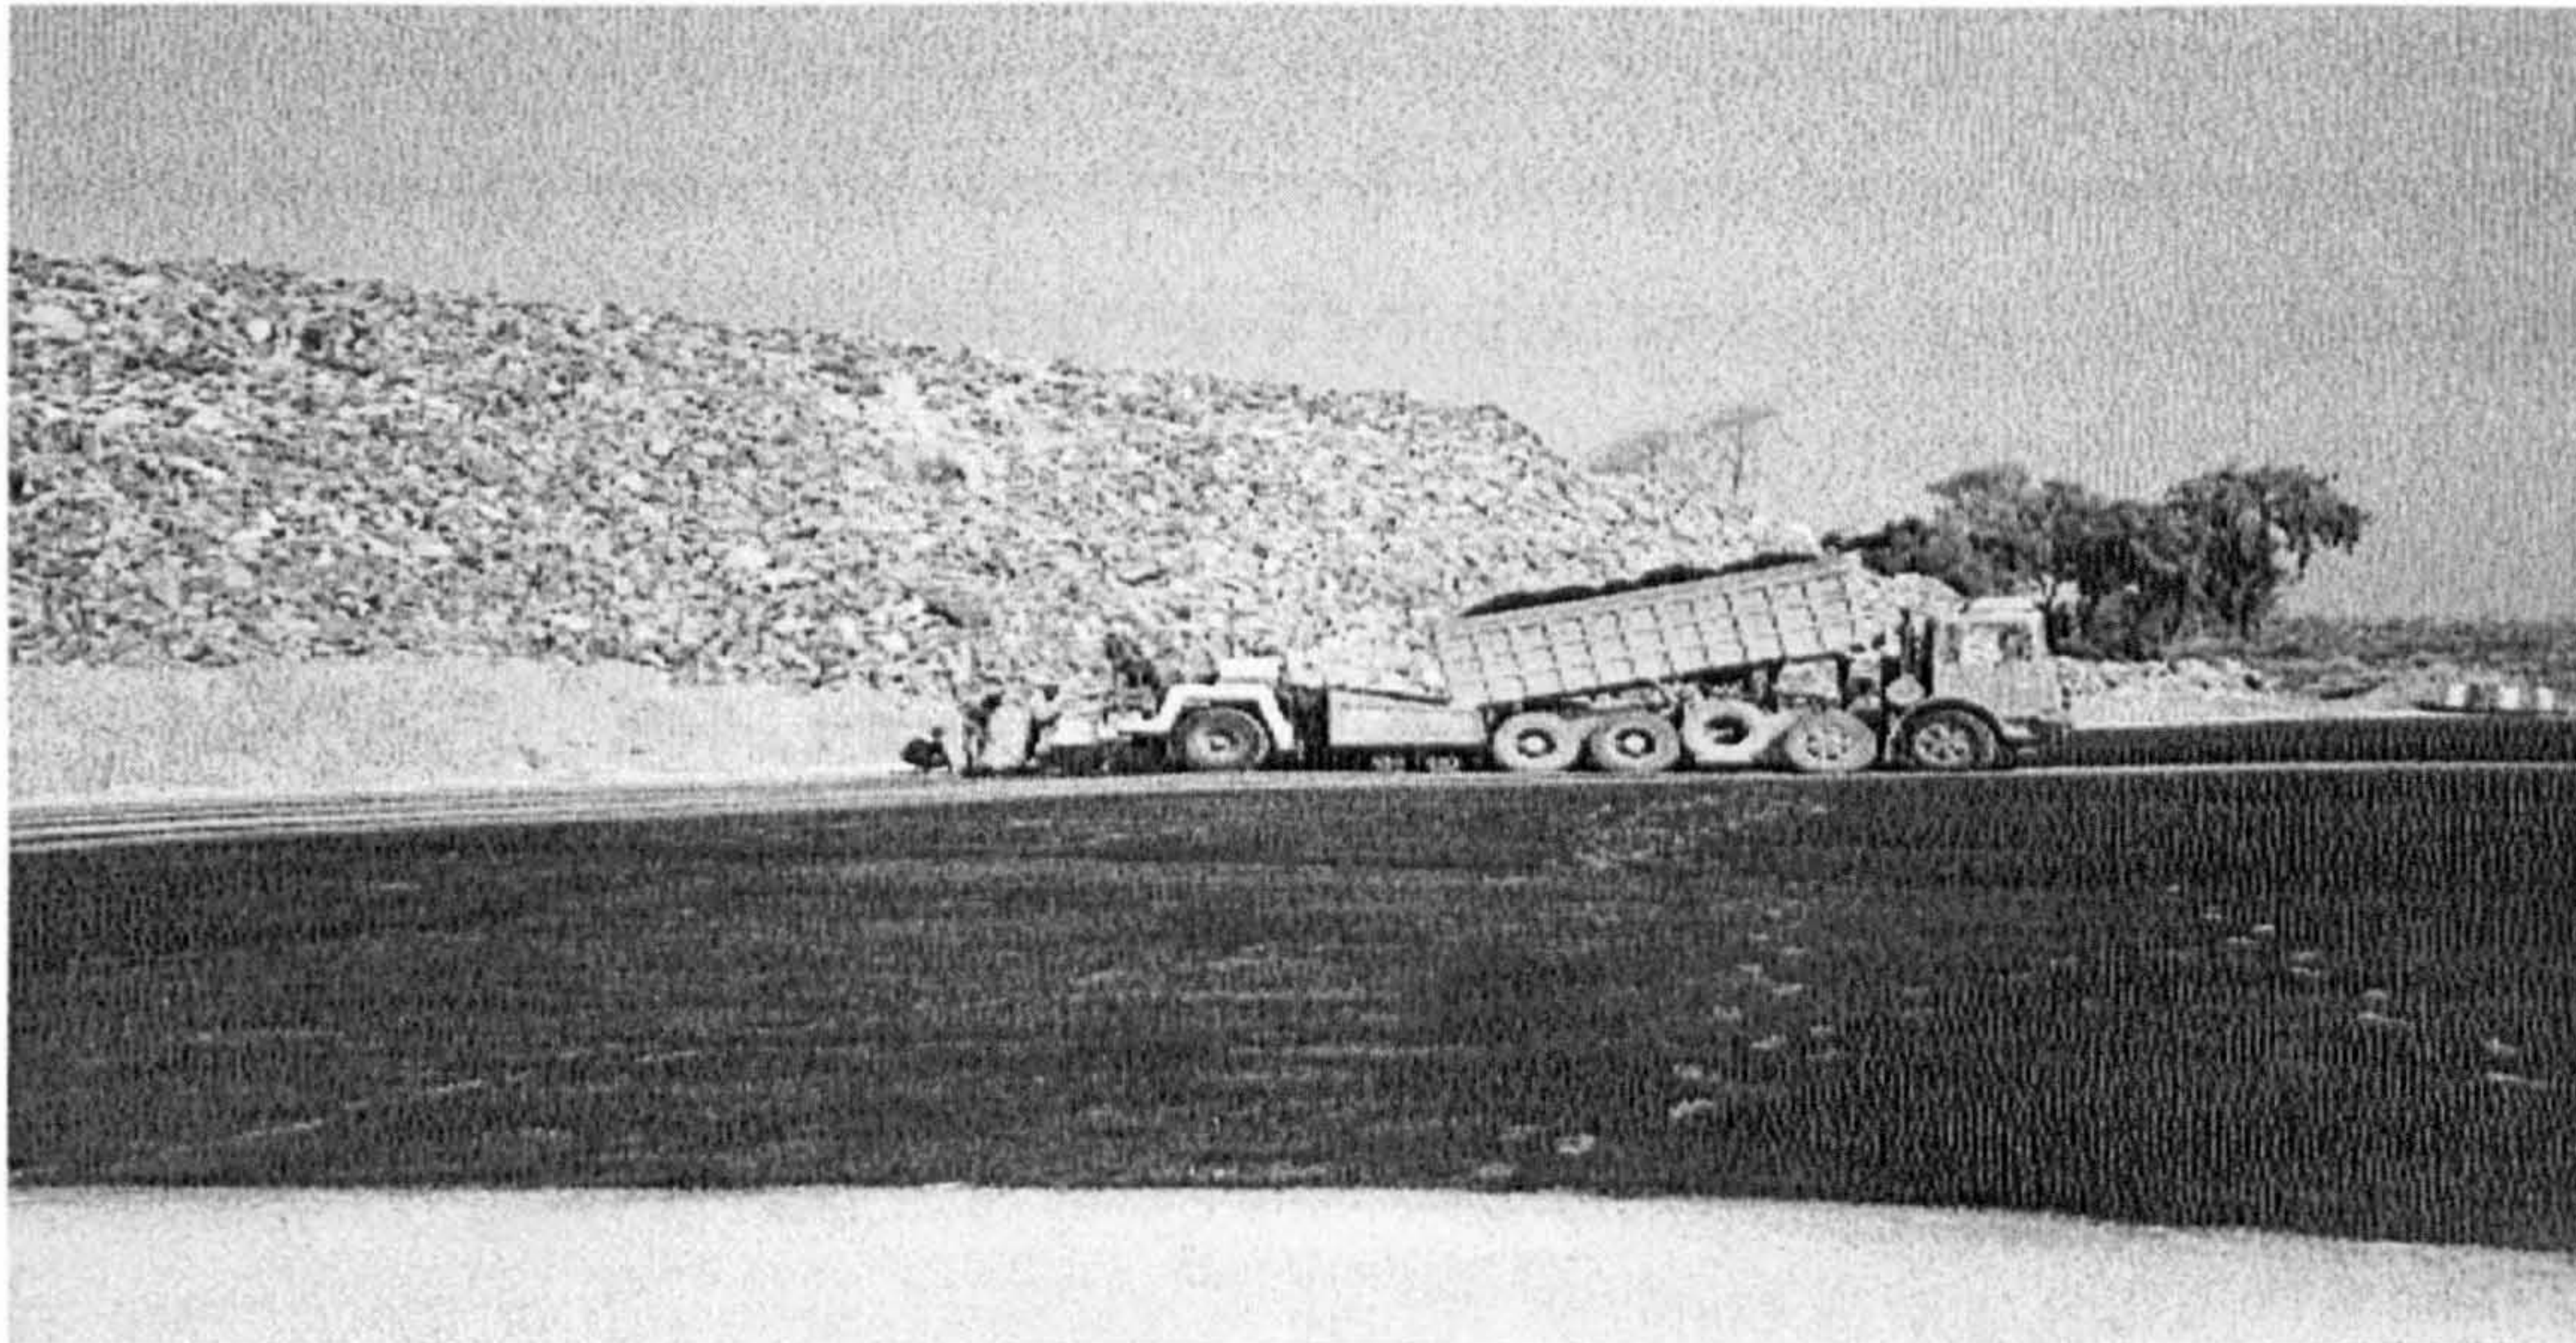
Construction of the landfill: Leveling, construction of the boundary dams, Lining with asphalt, and soil compaction.
